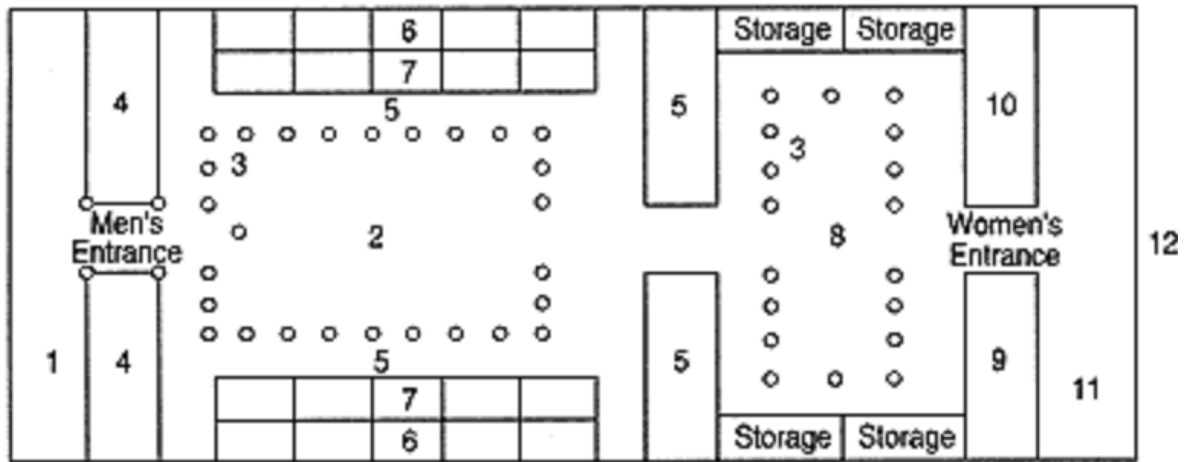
Plan of the ground floor of a simple Nakarattar House with the number denoting the following. Front male section: 1. Veranda. Central Section: 2. *Hal vitu* or *vitu*: first courtyard, 3. *Tontu*: columns, 4. *Melpati, tinnai*: a raised platform on which people sit, 5. *Valavu*: aisle or corridor surrounding the central courtyard, 6. *Ull arai*: *pulli*'s inner room for *puja* and storage, 7. *Veli arai*: *pulli*'s outer, 'conjugal' room. Back Female Section of House: 8. *Kattu*: second courtyard, 9. *Samayal arai*: kitchen, 10. *Kutchin*: a small room for women during menstruation and for girls during coming of age, 11. Veranda, 12. *Pin kattu*: open garden space with or without a well (Rudner 1994, Plate 9).
